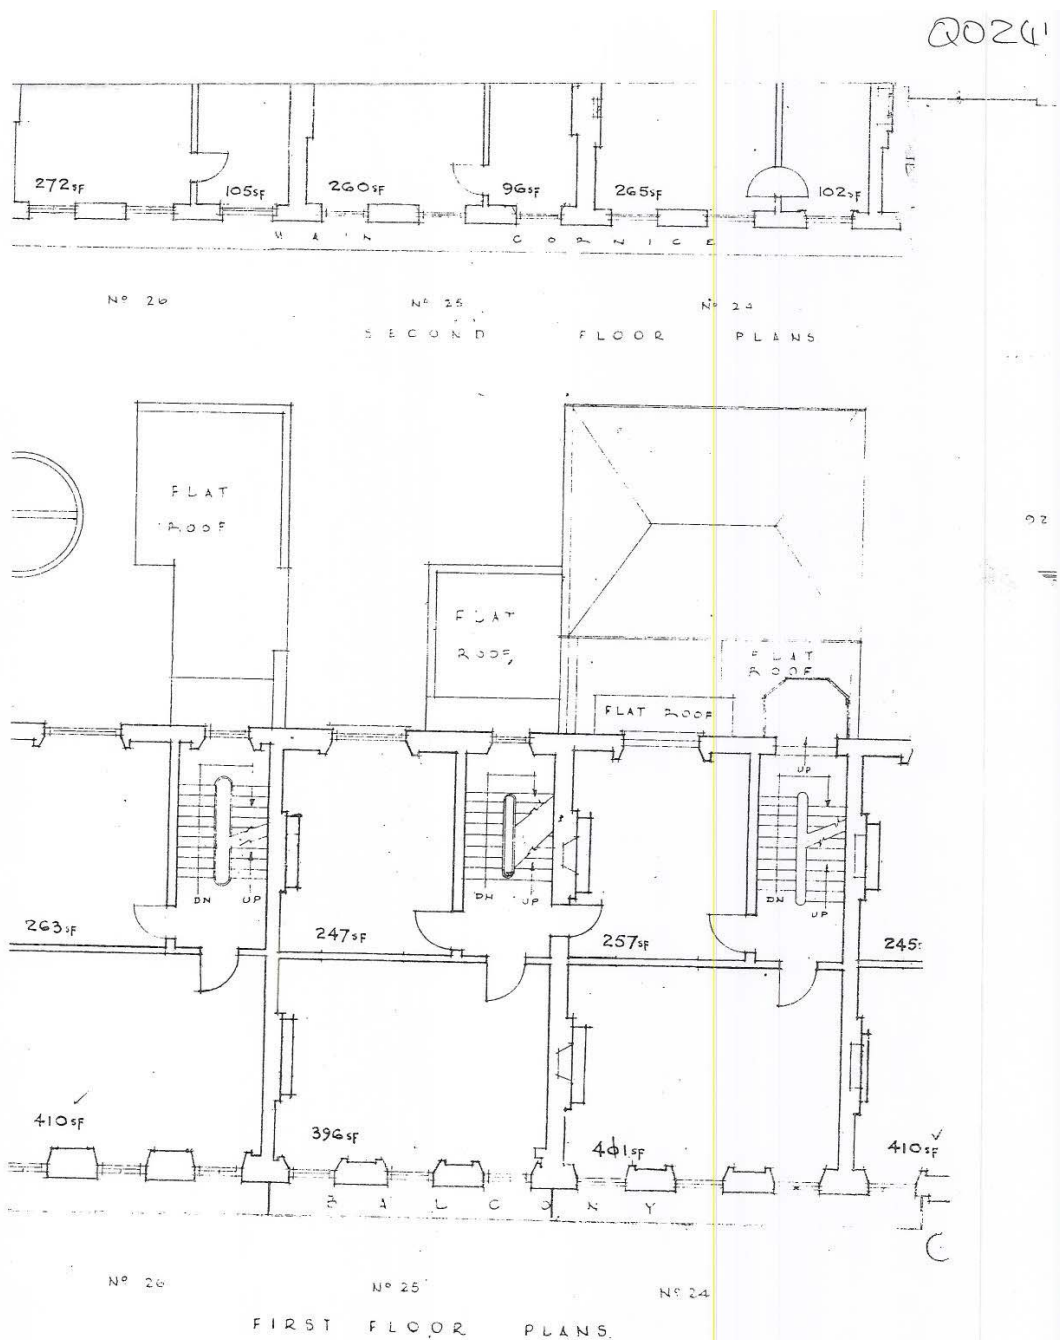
Extract from Ministry of Works Plans April 1946 First Floor Plans Nos: 26 – 24 Chester Terrace – The Crown Estate Archives
